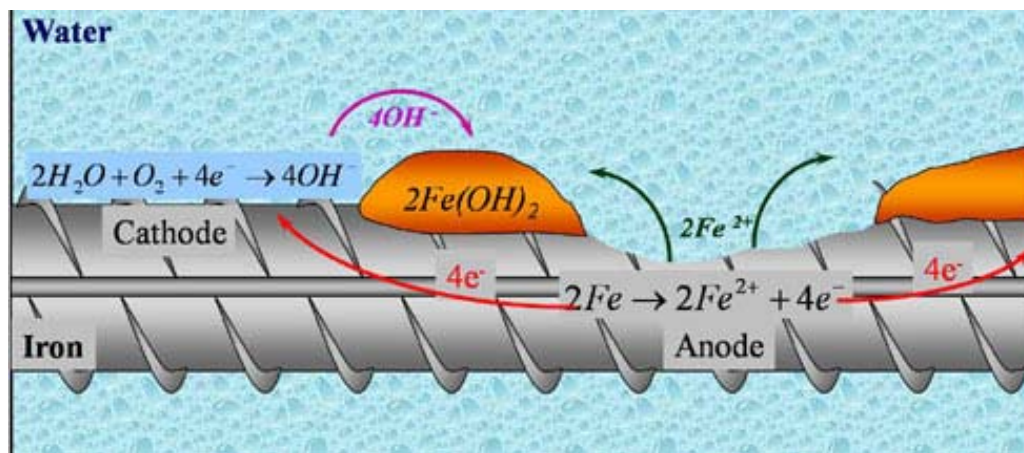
Reduction in Steel Section (Portland Cement Association, 2014)
